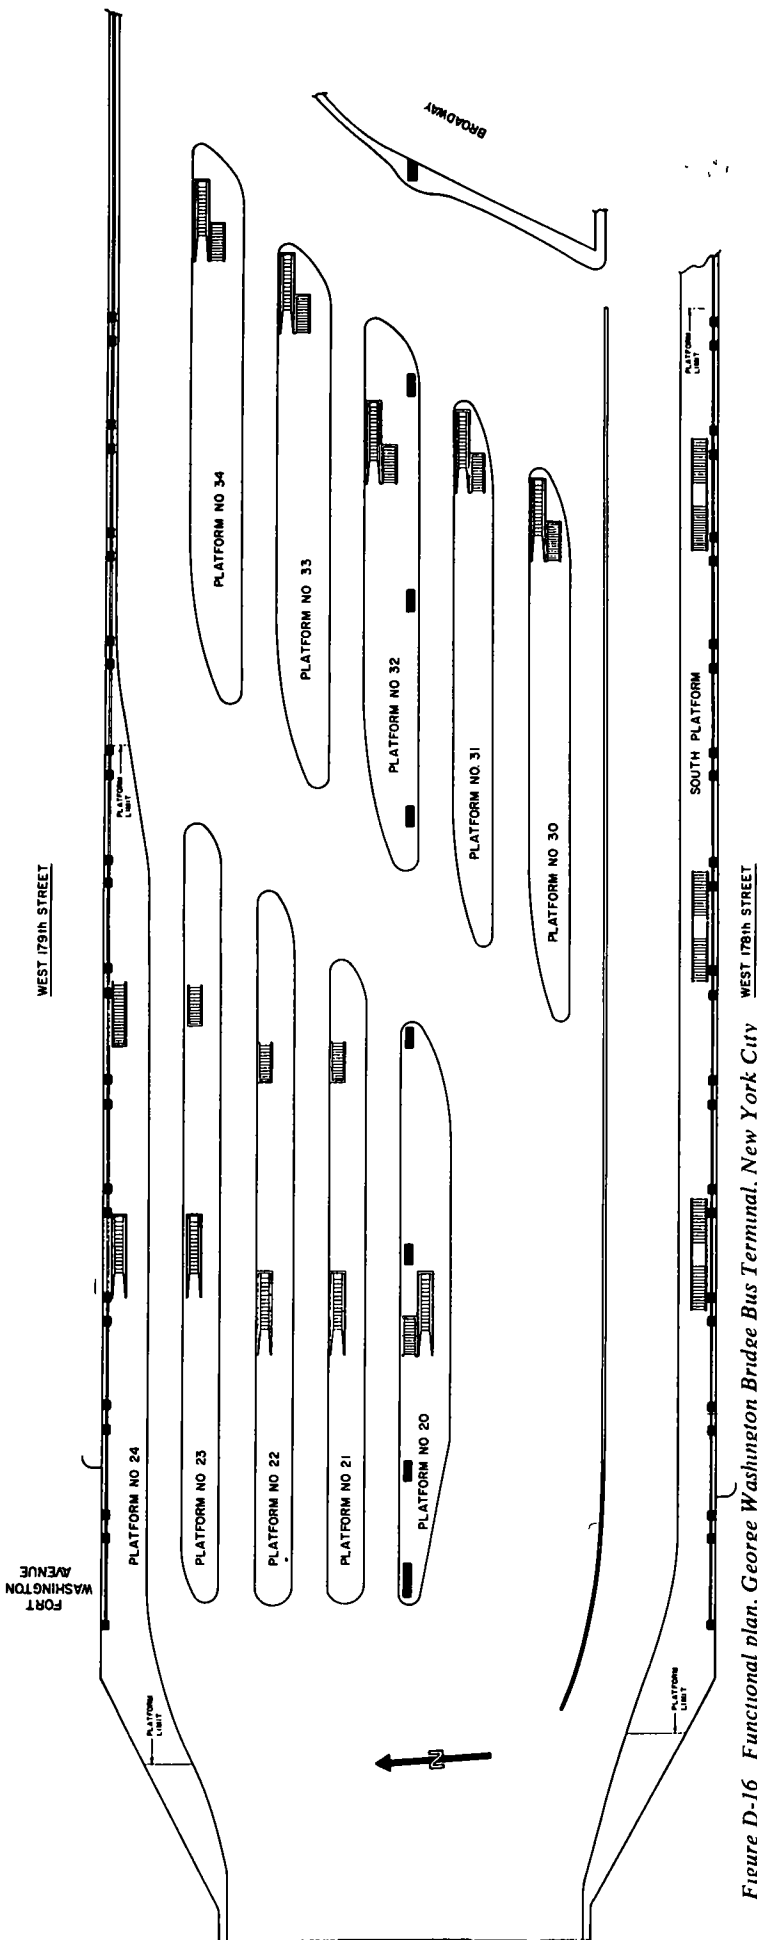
Functional plan, George Washington Bridge Bus Terminal, New York City
